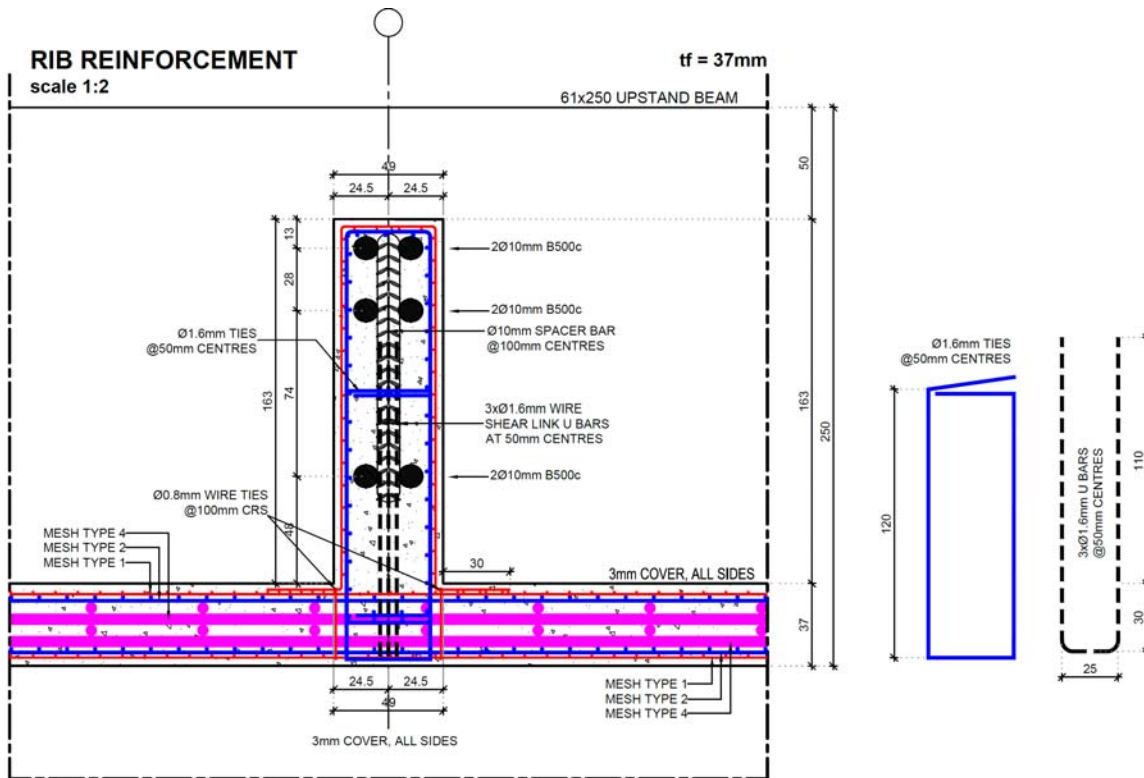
3D Indicative T section of ferrocement for the bottom skin
